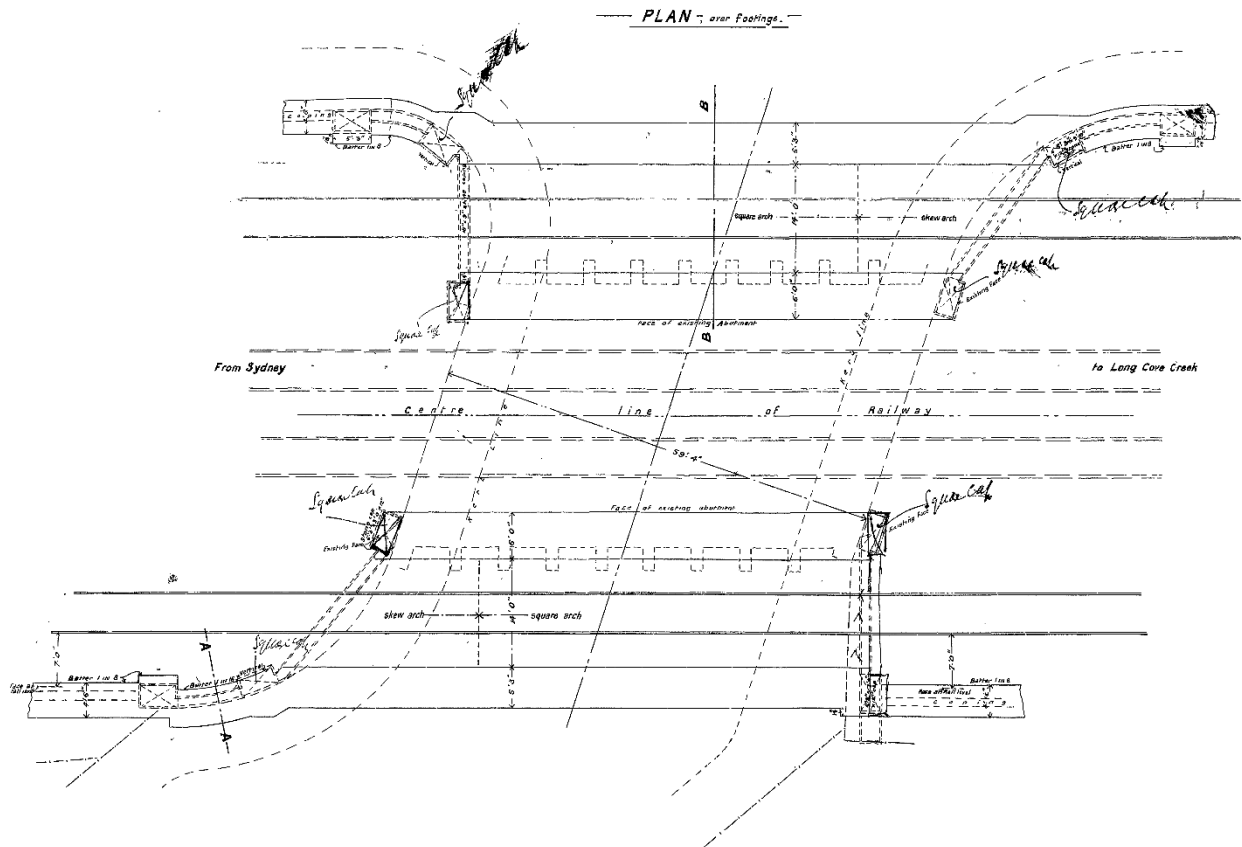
Plan of the January 1891 widening of West Street Bridge by addition of a single-track brick arch on both ends of the overbridge. Parts of the span are shown as skew arches. ARHS plan collection.
